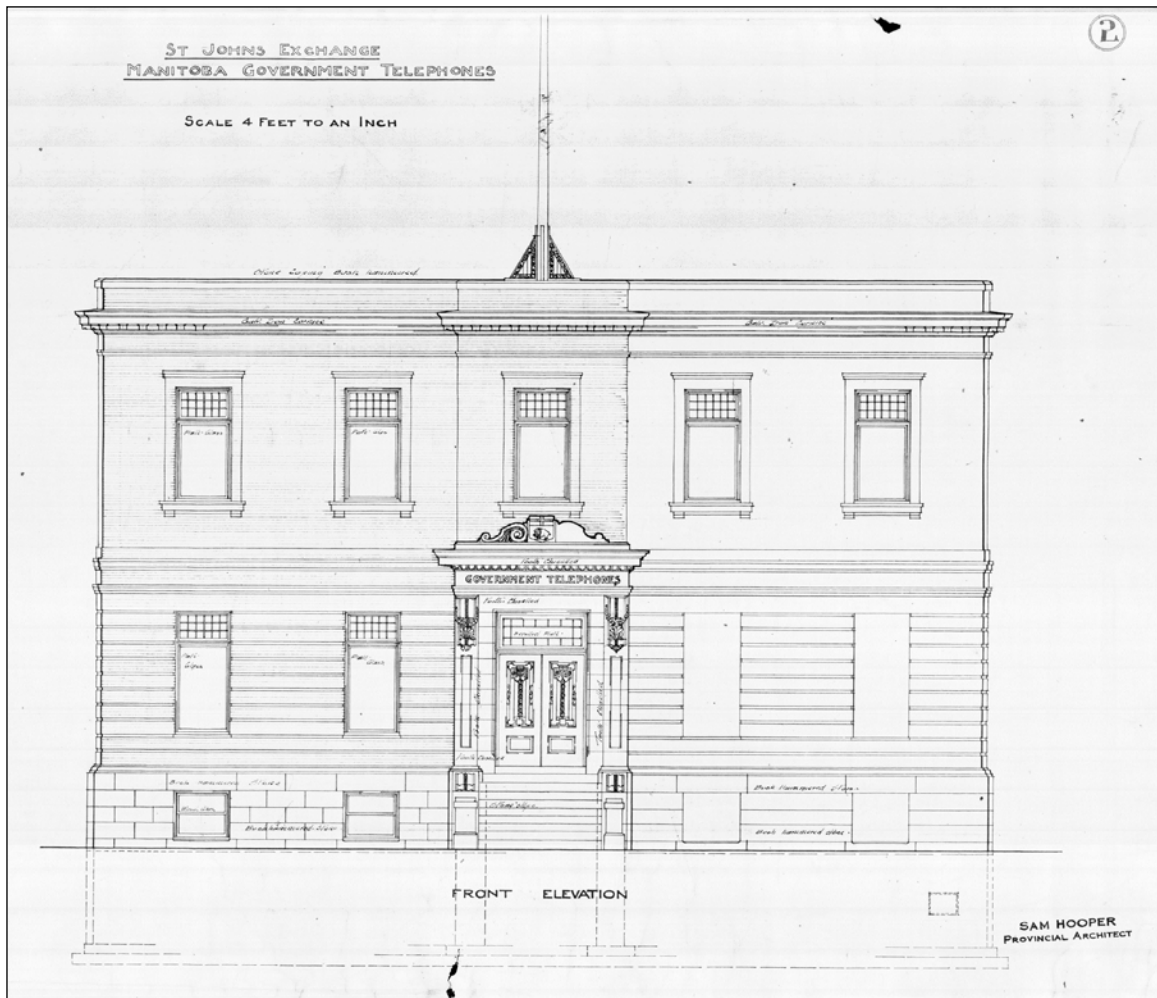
Manitoba Telephone System, St. John's Telephone Exchange, architect's plans, "Front Elevation," 1910. (City of Winnipeg, Plan No. 2706/1910.)
